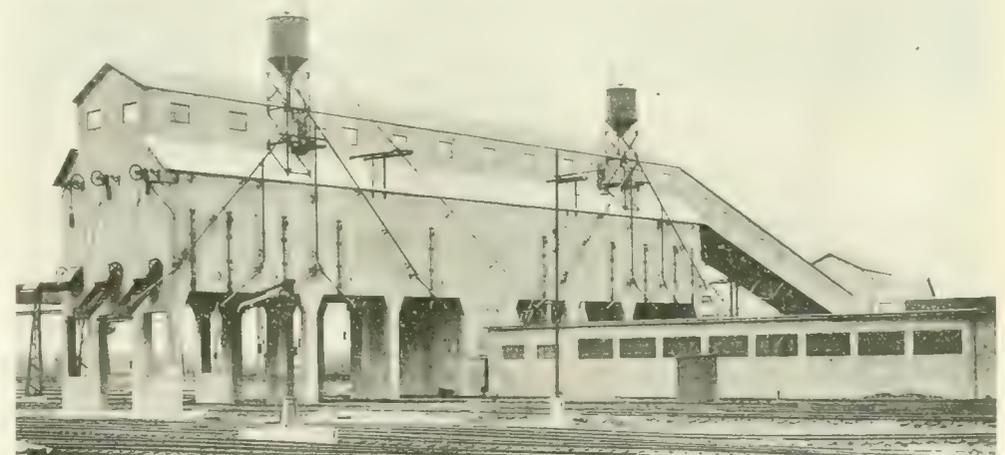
View of Coaling Plant (Looking North) of Locomotive Terminal. Note Sand Storage Tanks at Top of Building.
